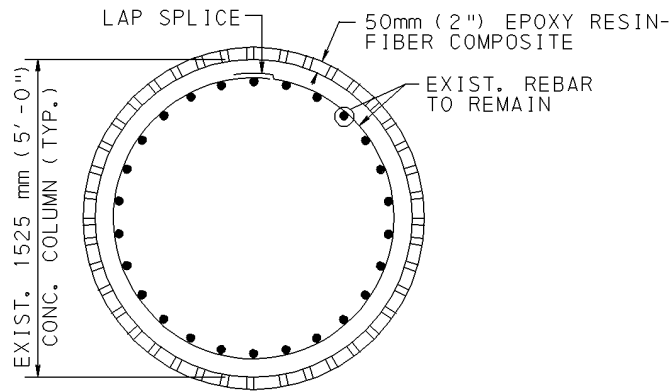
Reinforced Concrete Column Retrofit-3
